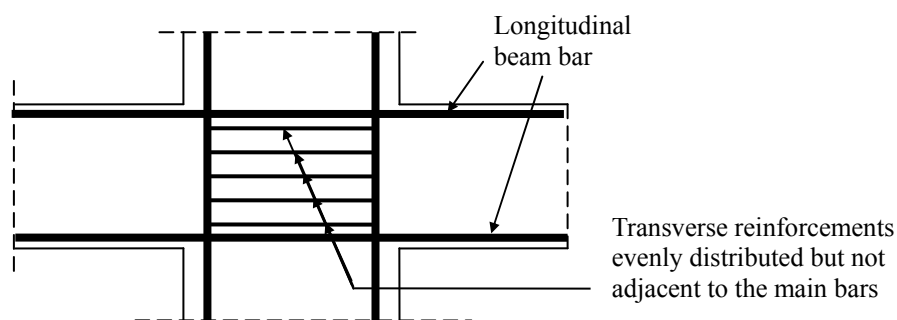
Transverse reinforcements in Column Beam Joint
